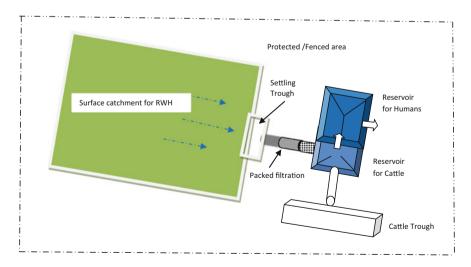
Sketch of the site plan for the proposed rainwater harvesting catchment in Borena
